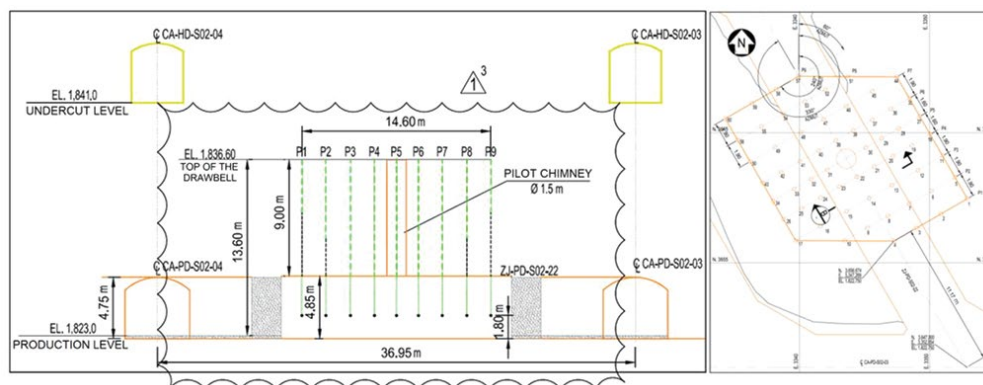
Drawbell 1 design section and plan view (Paredes and Rodriguez, 2018)
